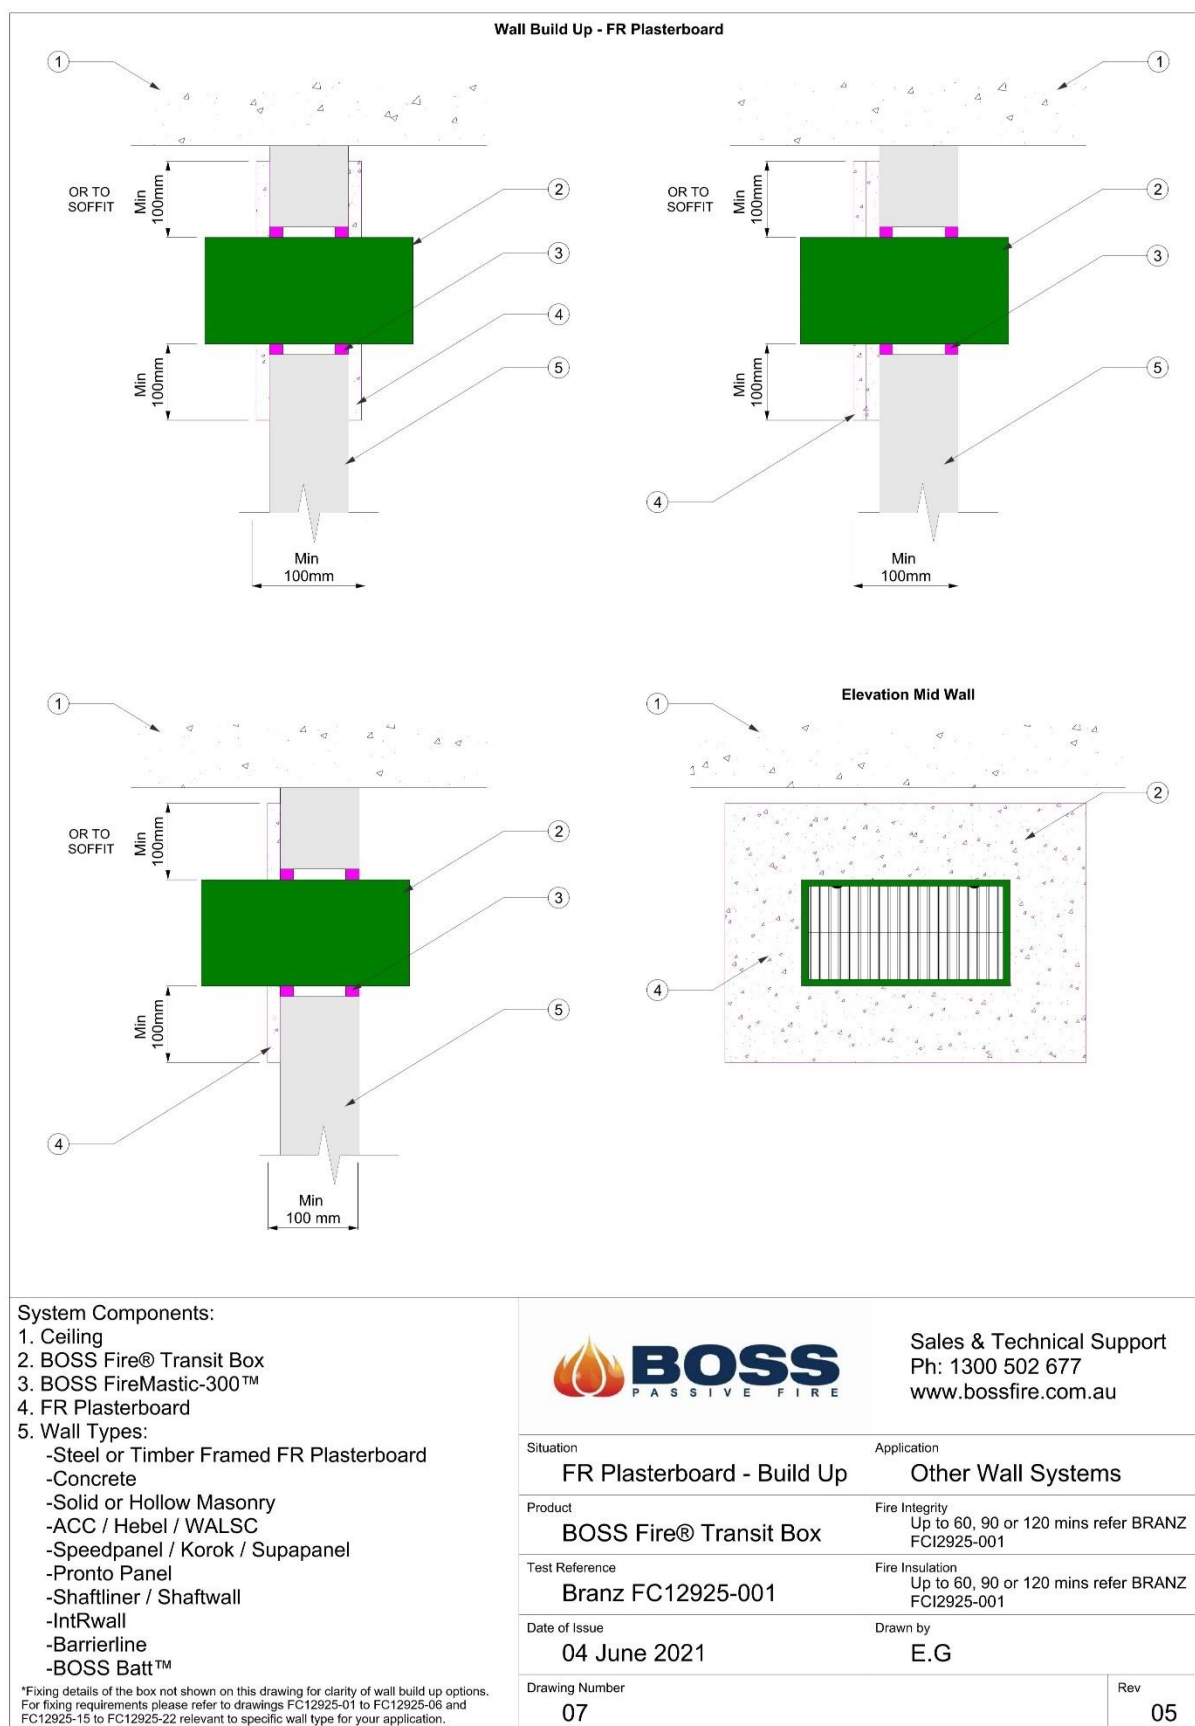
BOSS Fire® Transit Box – Soffit Mount Built-Up Wall Systems (Plasterboard)
